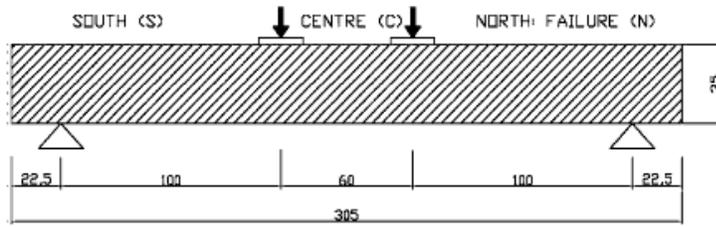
Two point loads test set-up (Etxeberria.et al. 2006)
